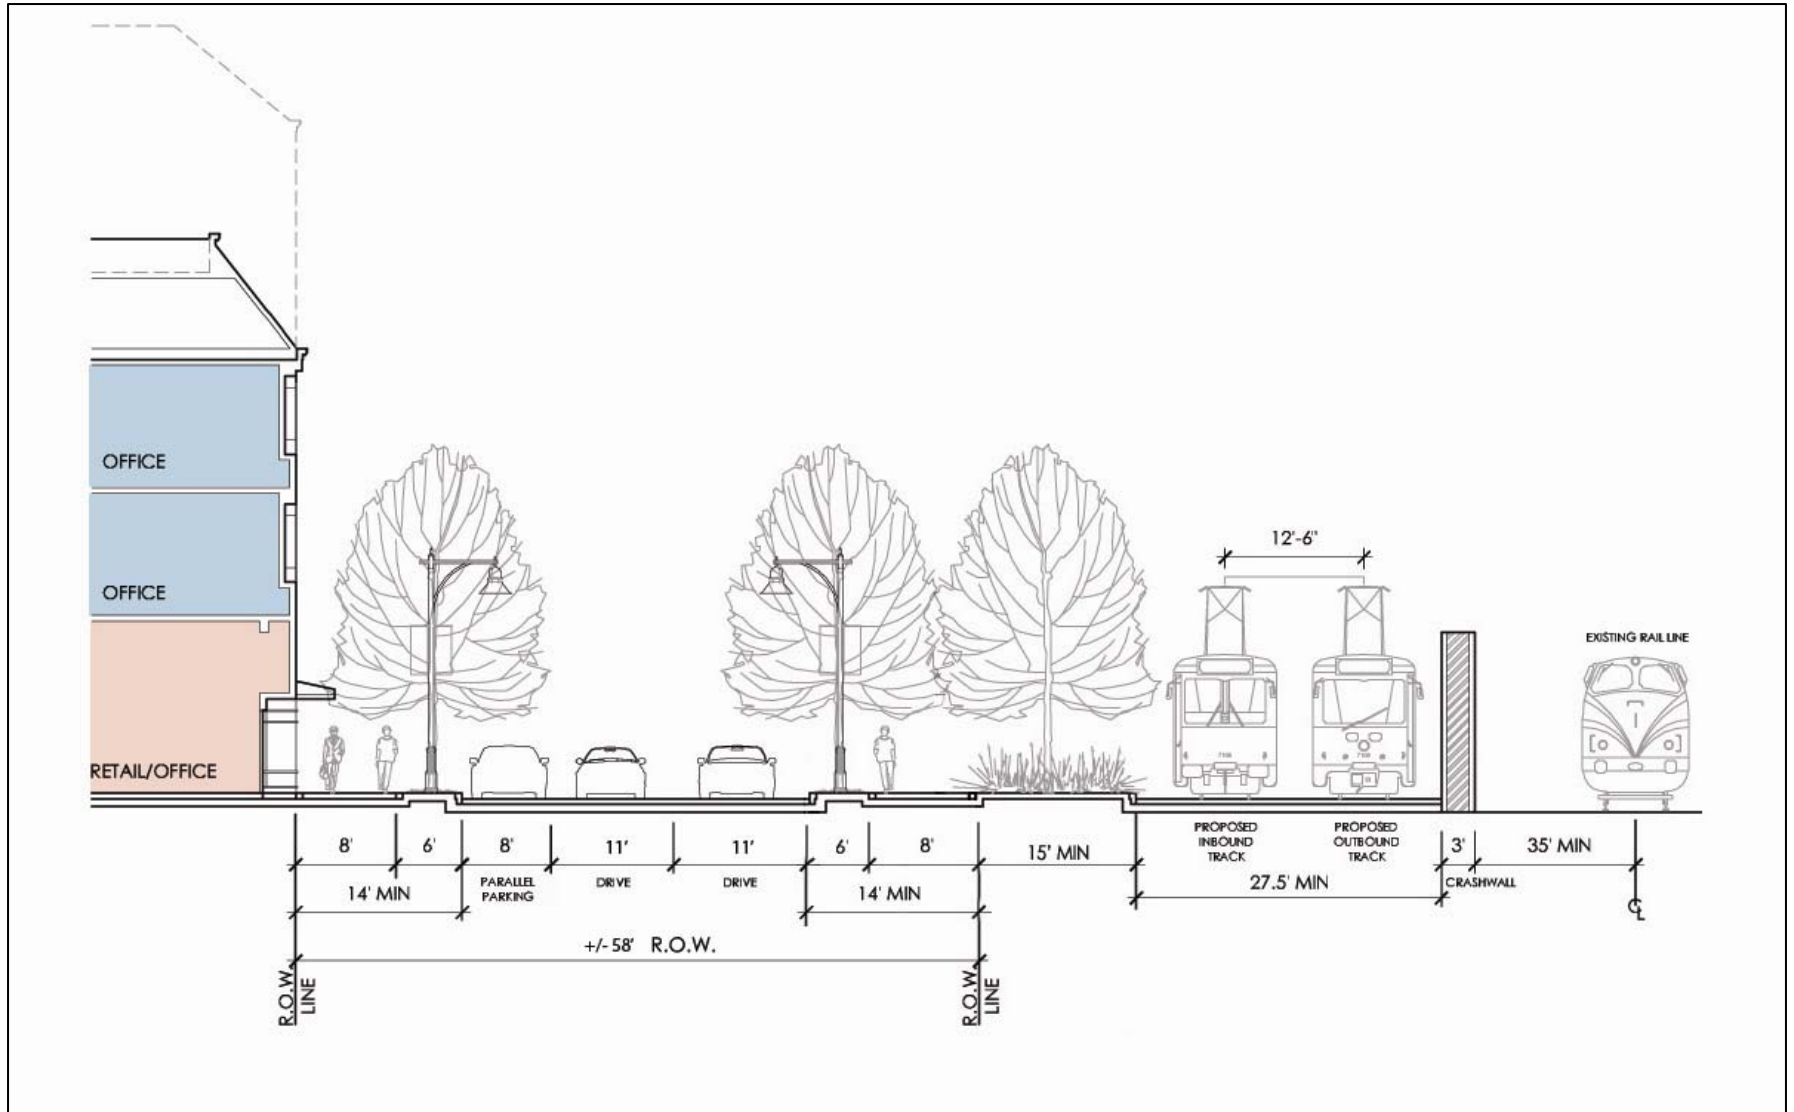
Waldorf Urban Local Road – Recommended section if buildings front to a local road adjacent to a light rail line.
